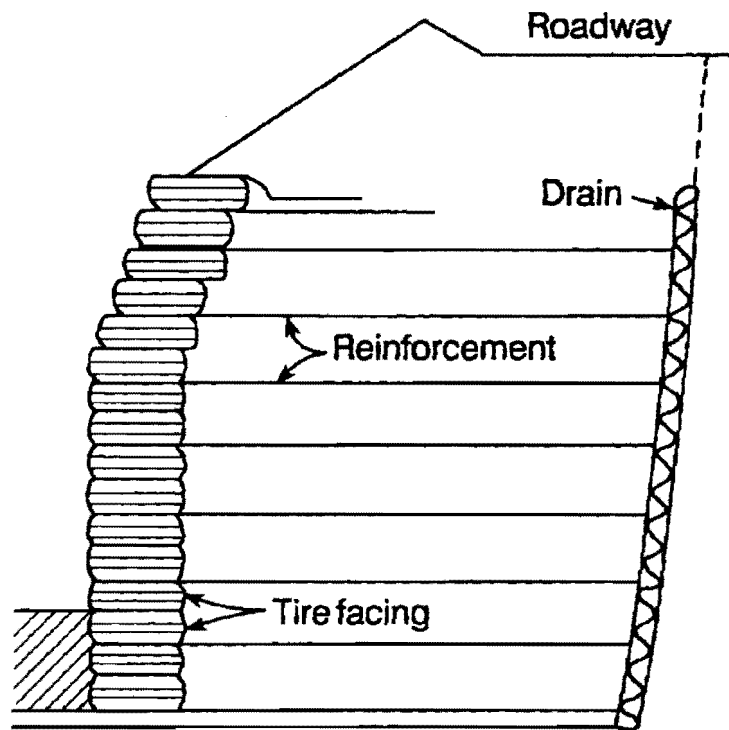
Geotextile Reinforcement between Tire layers (7)
